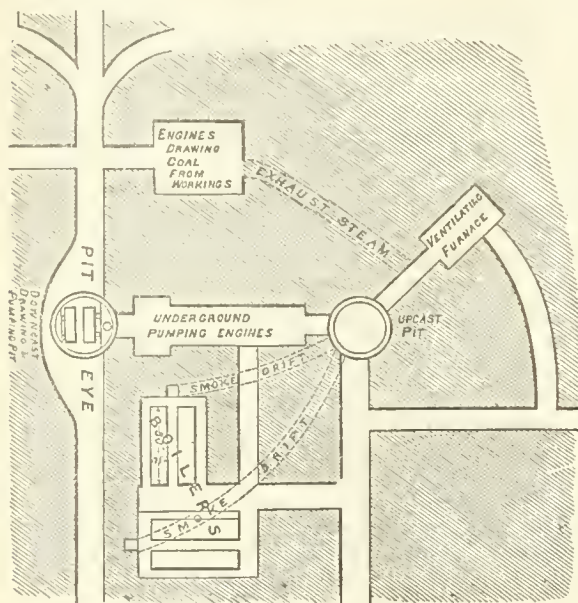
Pit bottom arrangements, Cambois Colliery.
